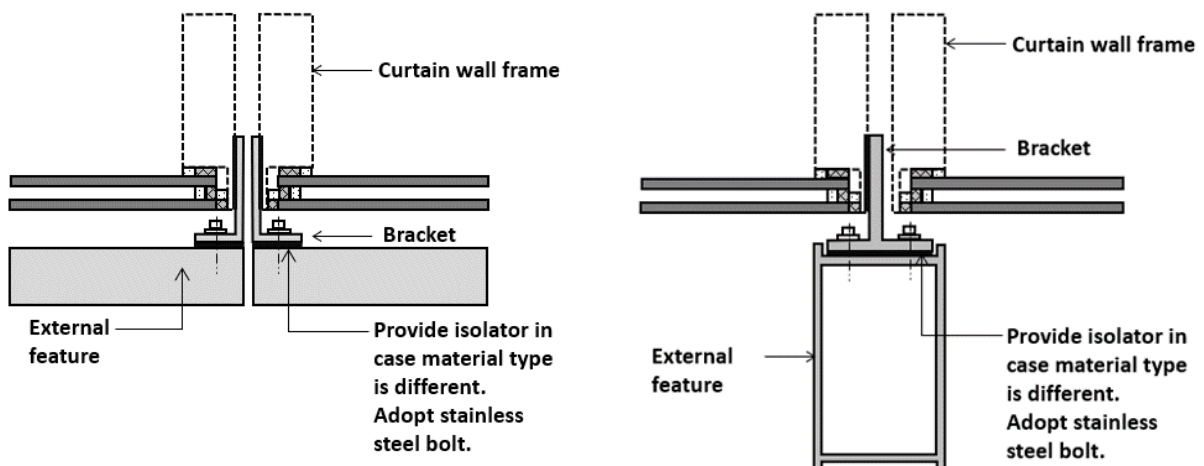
Example – plan drawing (detail) on left and right illustration connection between curtain wall and metal external feature on the exposed face of the facade. Providing metals of similar properties or separator/isolator helps to mitigate risk of bi-metallic corrosion.
